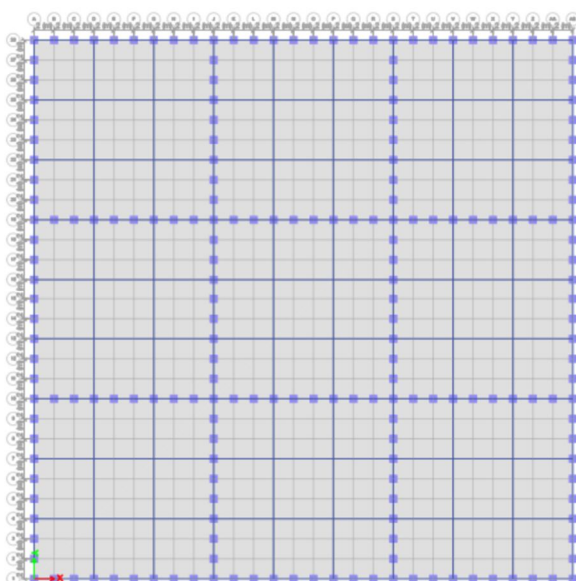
Plan of 1st to 10th storey of Bundled tube structure
